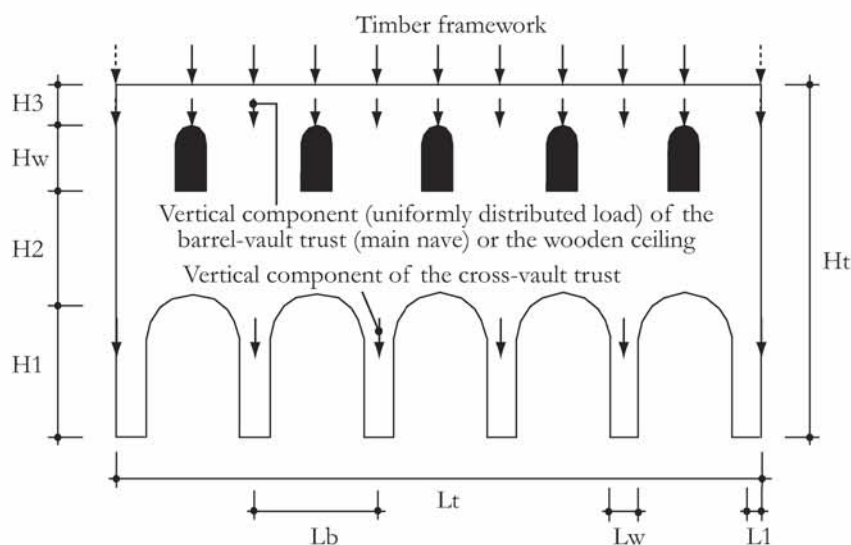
Loading configuration of a lateral wall LW1 when the main nave is covered either by a barrel-vault or by a wooden ceiling.
